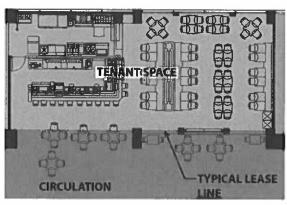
TENANT SPACE - CONCOURSE C - PLAN
